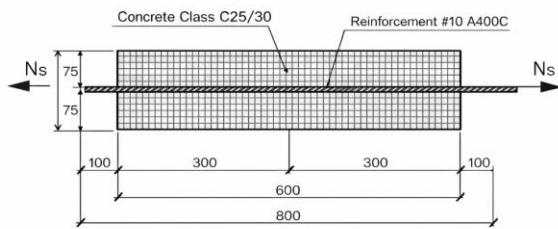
Two-dimensional model of reinforcement-concrete bond
